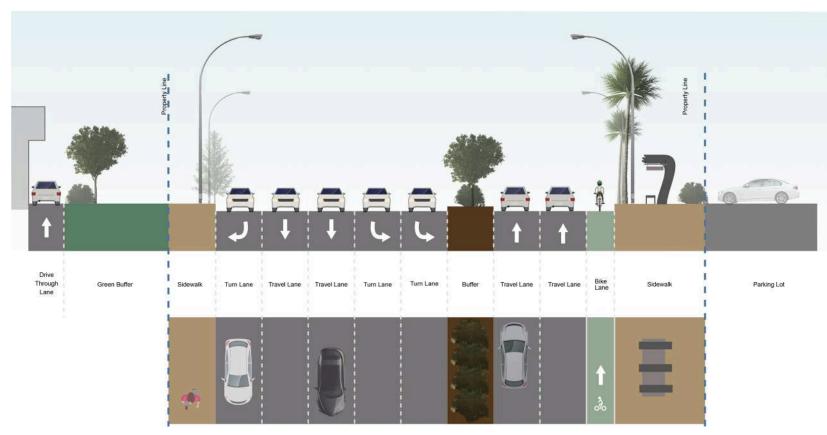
Existing Street Section - E. Kings Canyon Rd. @ S. Peach Ave.
